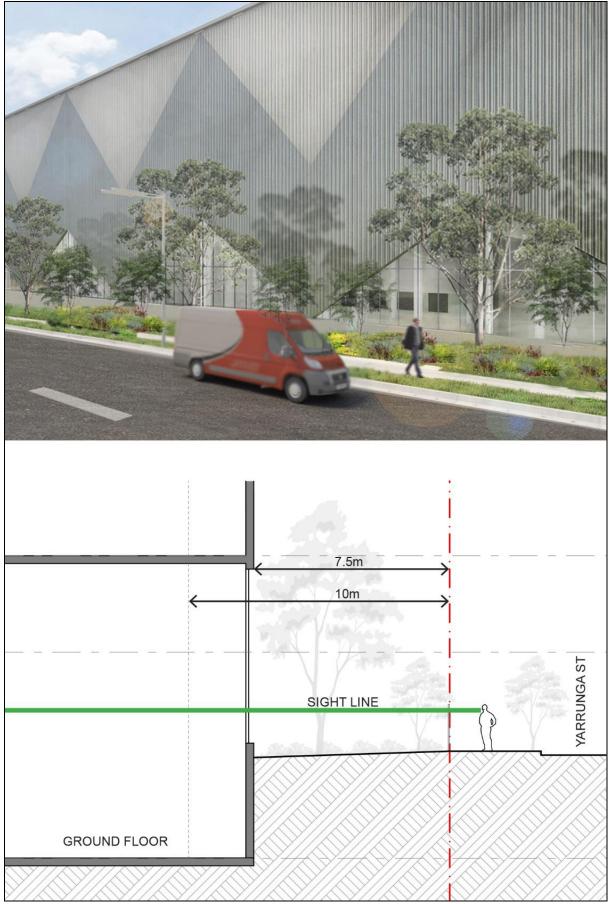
28 Yarrunga St façade and sectional street front analysis.
